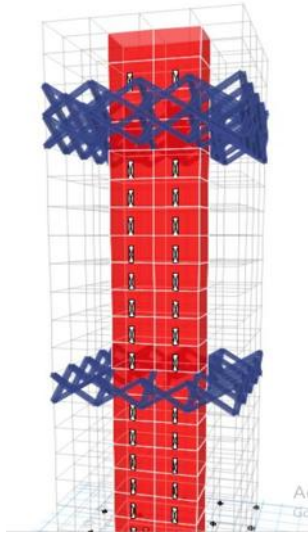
3d view showing outrigger elements at Story 7–8 and Story 16–17 with shear walls
